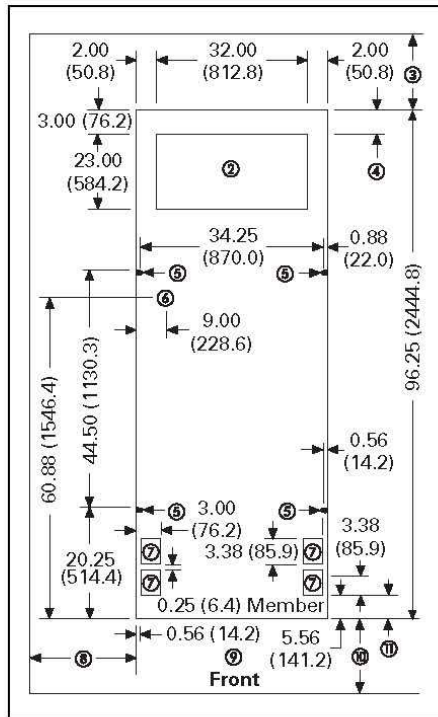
Base Plan of Typ. Indoor Breaker & Aux Structures
